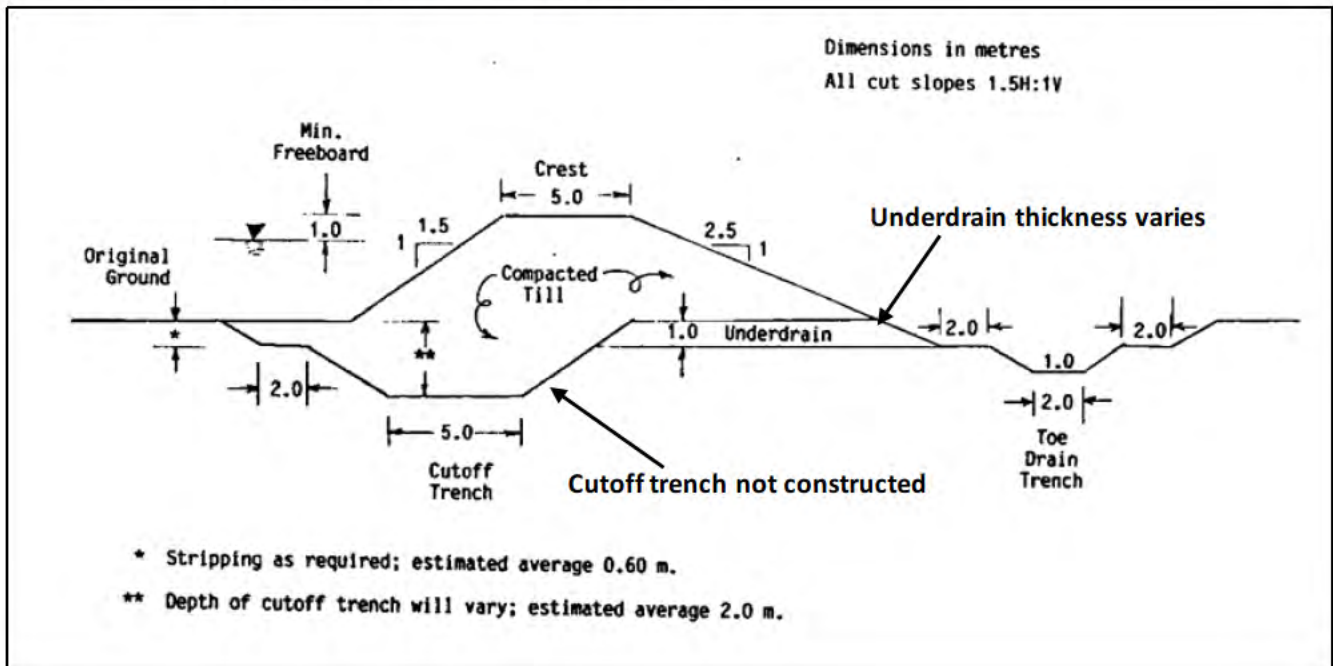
Typical As-Built Dam Cross Sections (Old Datum) (Dick 1989)
